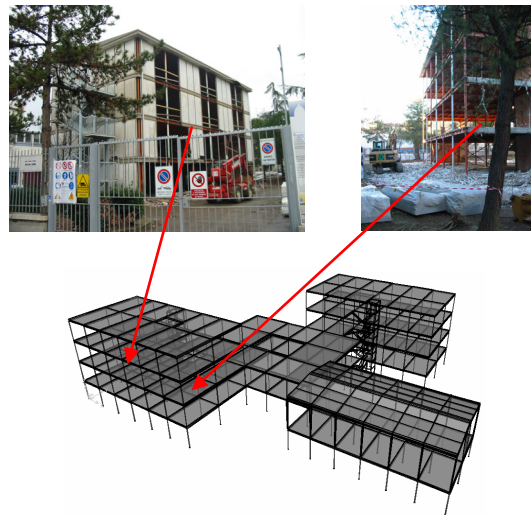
Views of the Building During the Demolition Phases of the Infills, and Relevant Viewpoints on the Finite Element Model of the Original Structures
